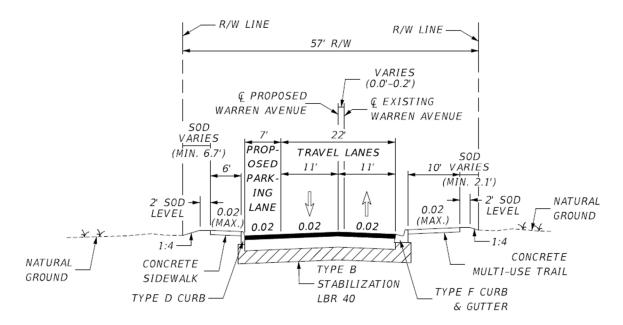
Alternative 1 Typical Section from 760 ft East of Lemon Lane to 700 ft West of Milwee Street
